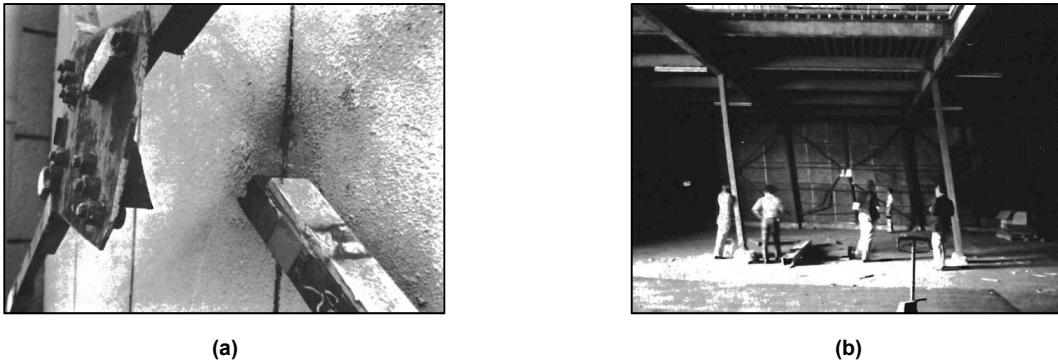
Photographed damage from the 1978 Miyagi-Ken Oki earthquake: (a) damaged steel frame furniture warehouse located on the outskirts of Sendai with rupture at bolt holes; and (b) Sendai Unyu Soko warehouse showing perimeter bracing with unbraced center bays [photographs courtesy of EERI 1978].
